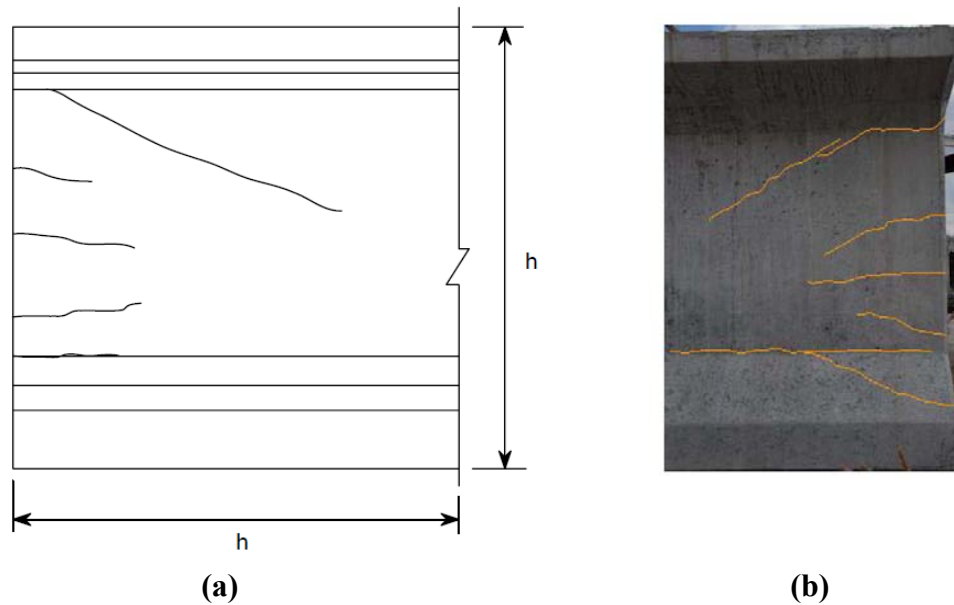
Typical end zone cracking in the modern precast pretensioned concrete I-girders: (a) Common patterns of end zone cracks observed in the precast prestressed girders in state of Virginia (Crispino, Cousins, & Roberts-Wollmann, Anchorage Zone Design for Pretensioned Precast Bulb-T Bridge Girders in Virginia, 2009), and (b) Typical bursting and spalling cracks in a production AASHTO Type VI girder included in the Galveston Causeway Expansion Project, Texas (O'Callaghan & Bayrak, 2008).
